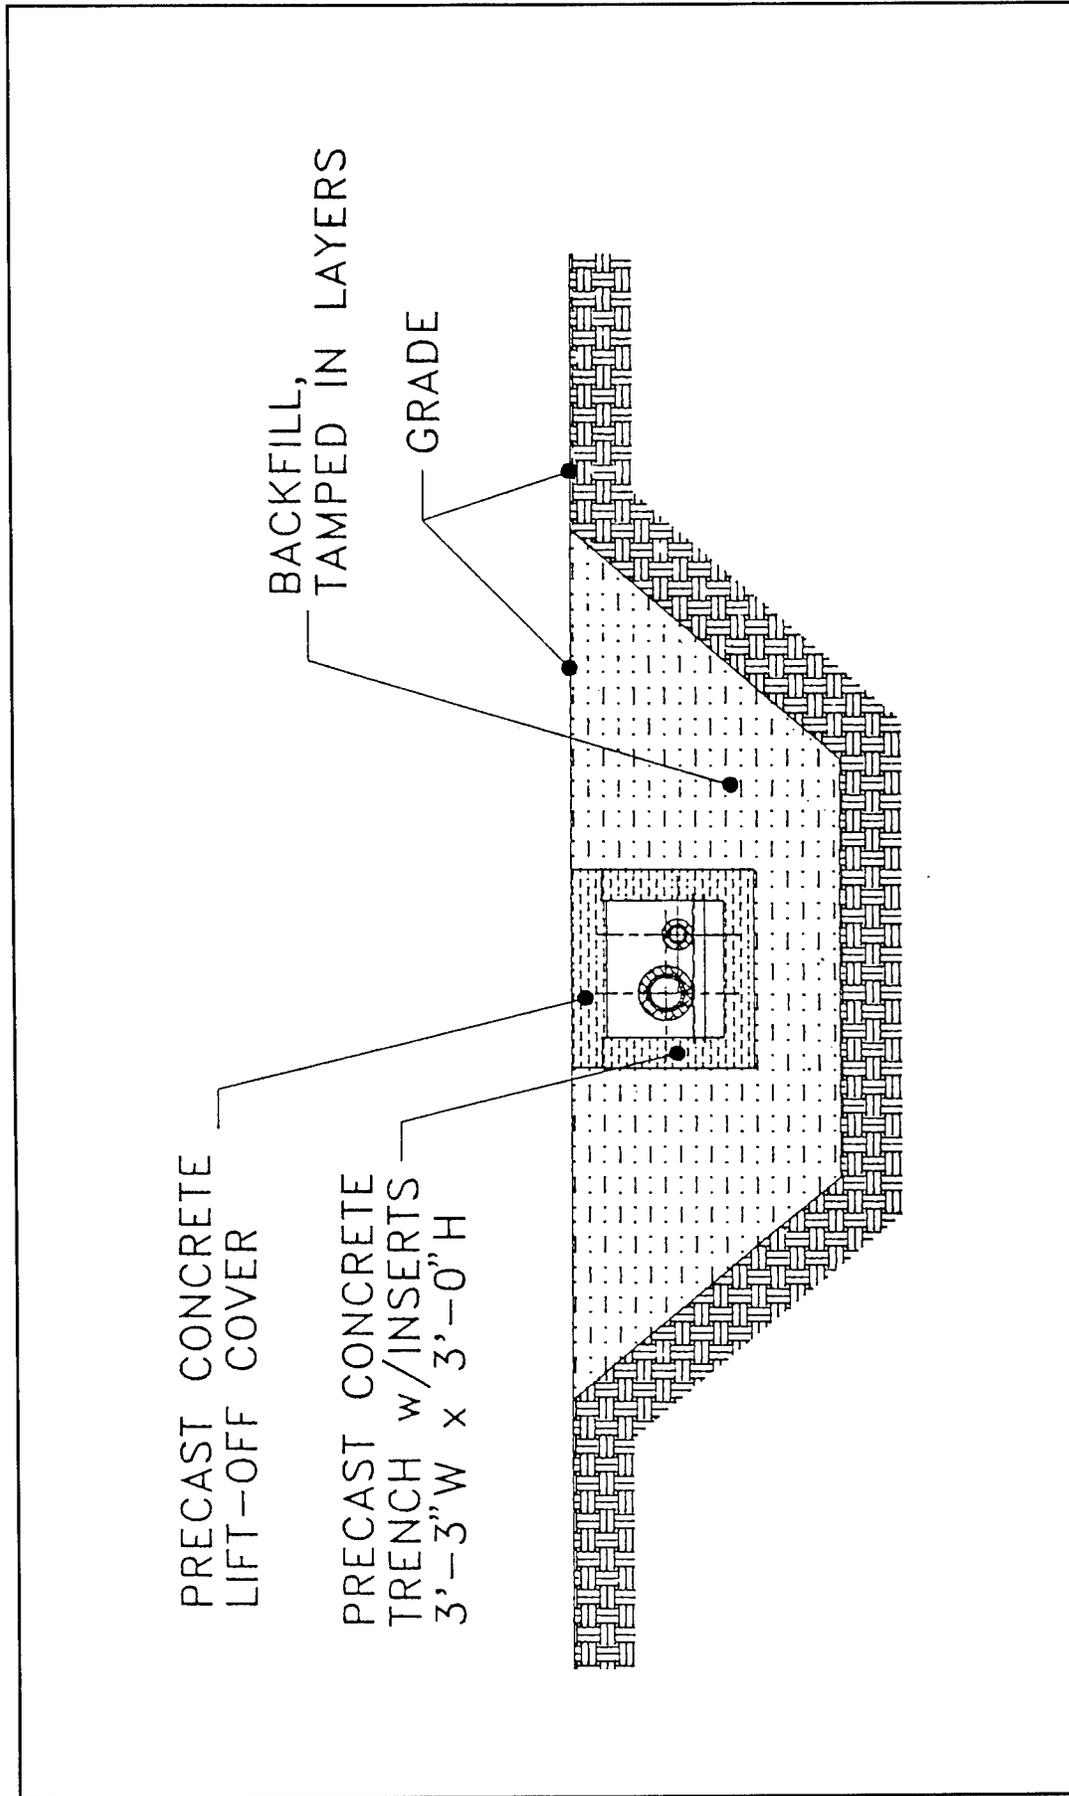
Steam distribution system design: shallow trench/walkway construction.
